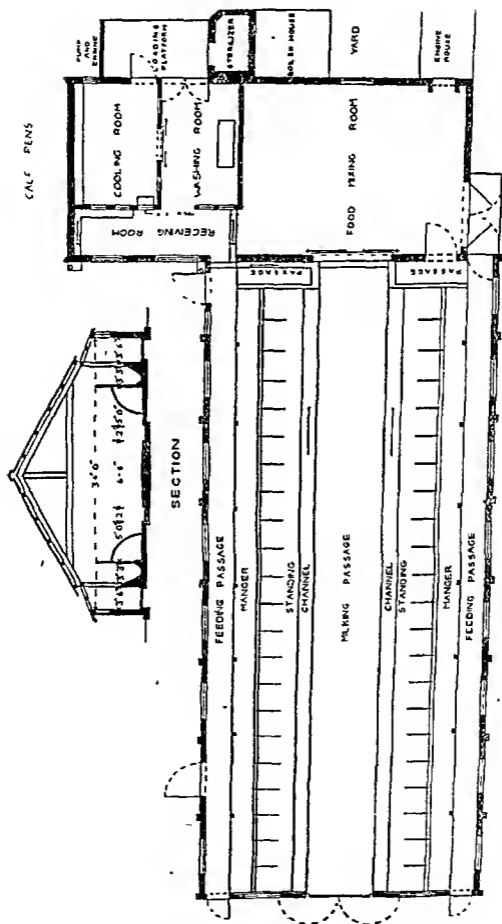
The buildings shown in Fig. 99 after reconstruction.
